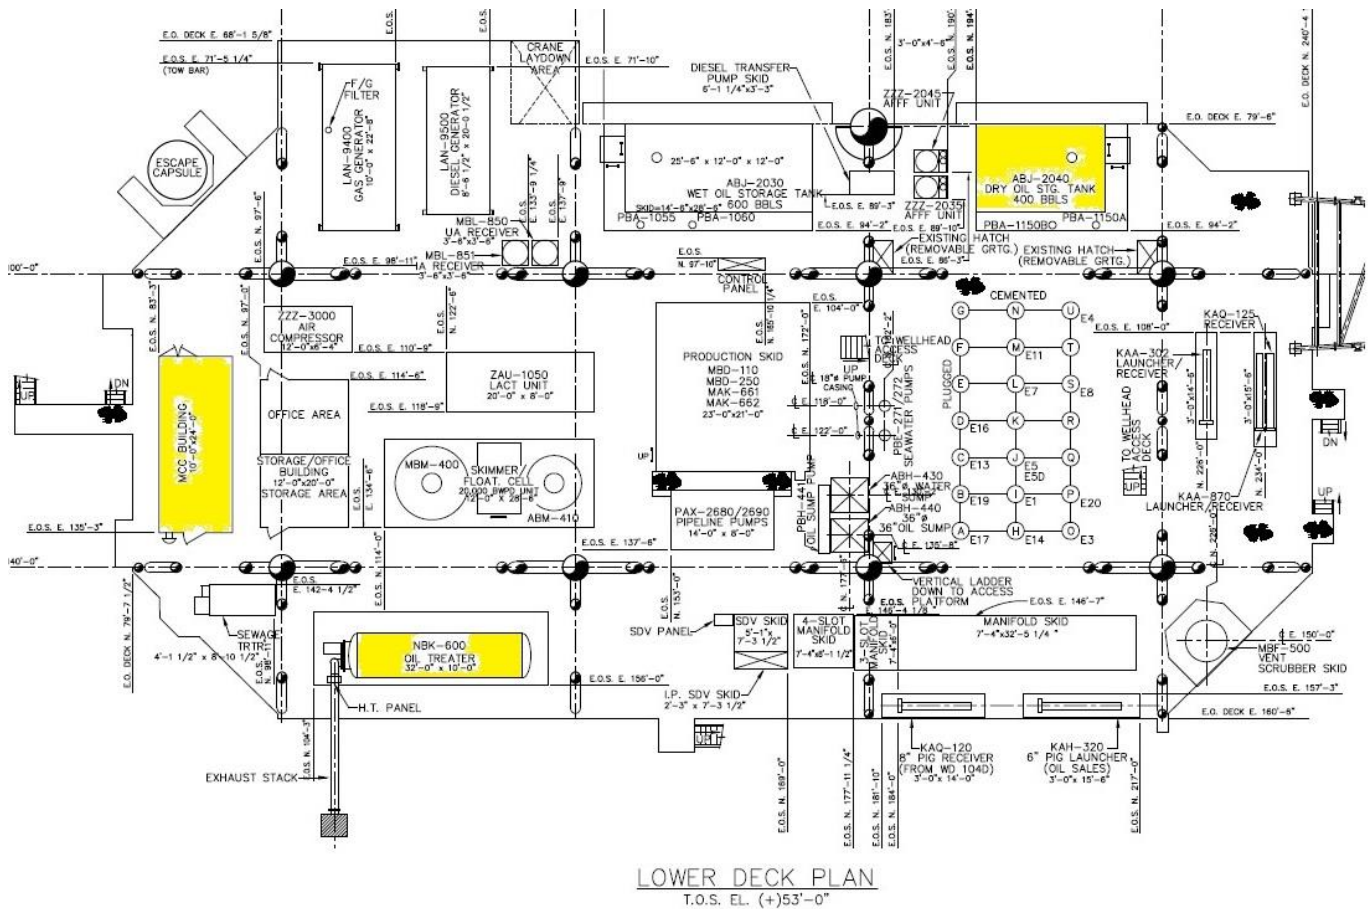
Partial Lower Deck Plan with Added Highlighting
